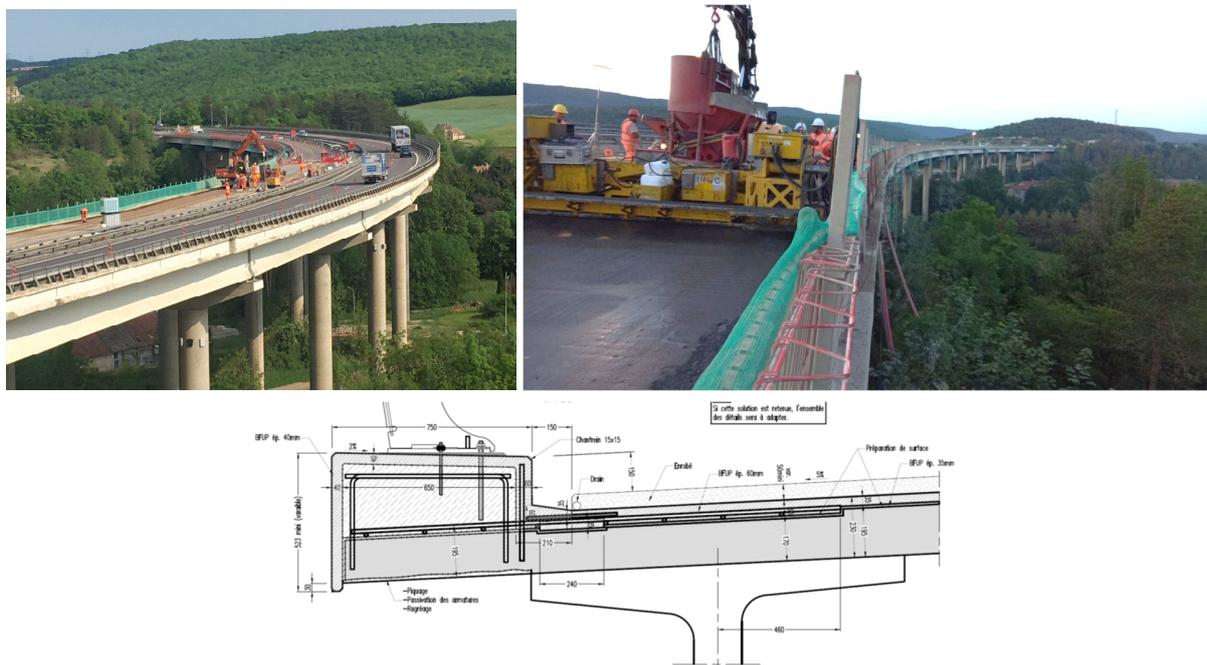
UHPC overlay on the Pont d'Ouche multi-span prestressed concrete girder twin bridges, ensuring waterproofing, surface protection and structural reinforcement for safety barrier anchoring.
